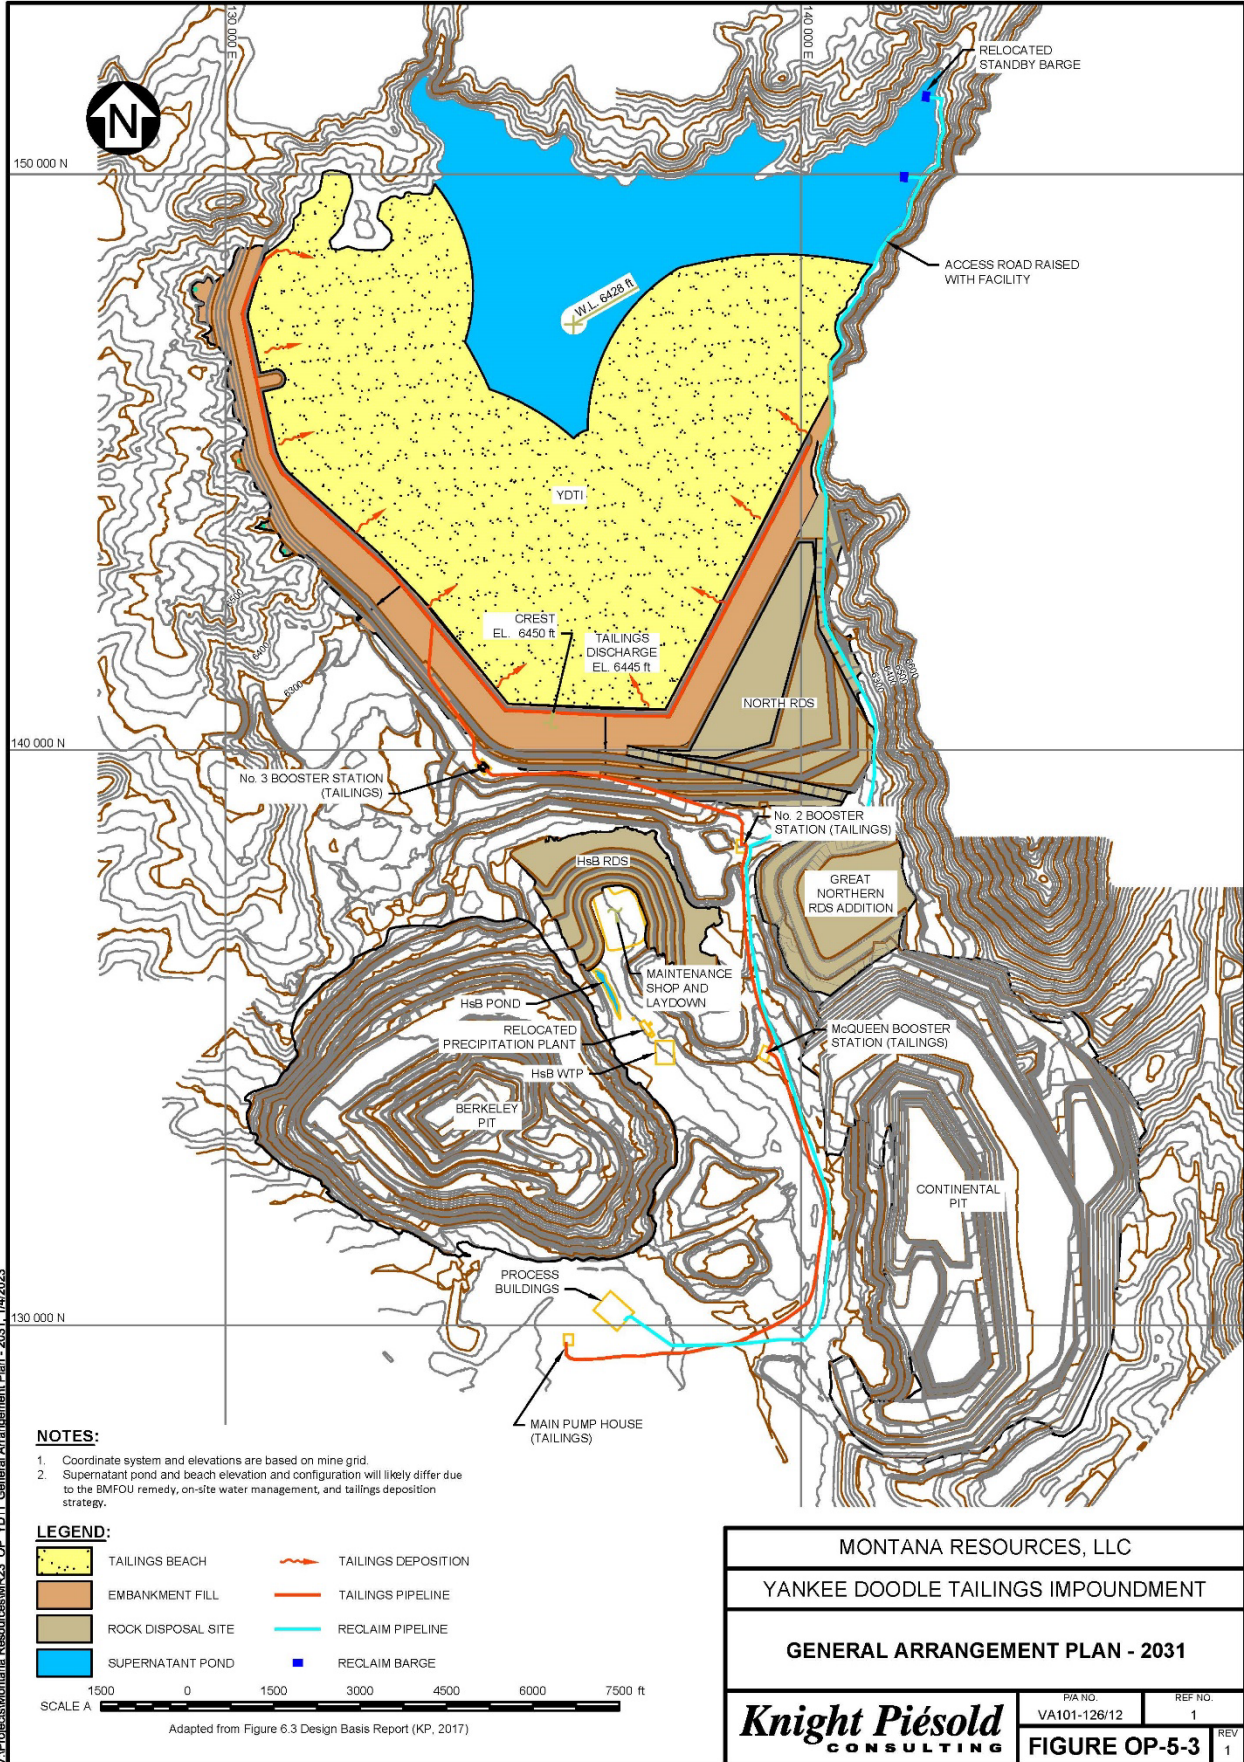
and Figure OP-5-3 depict the general arrangement of the YDTI corresponding to the 6450-foot elevation lift in 2022 and 2031. Supernatant pond elevations corresponding to embankment height and year are:
